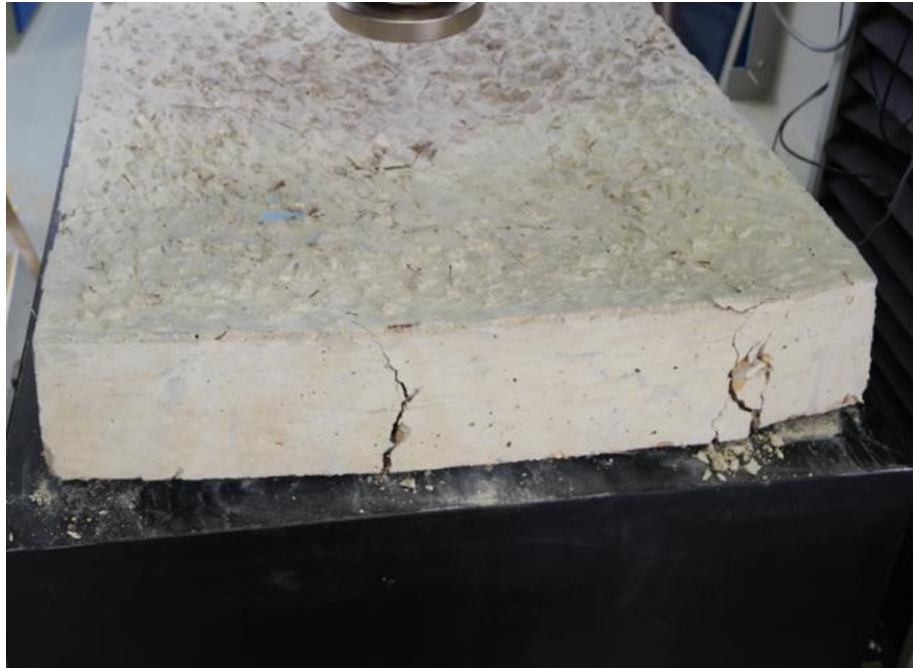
Mode of cracking on side and surface of slab 20 mm + 65/60 at testing position
